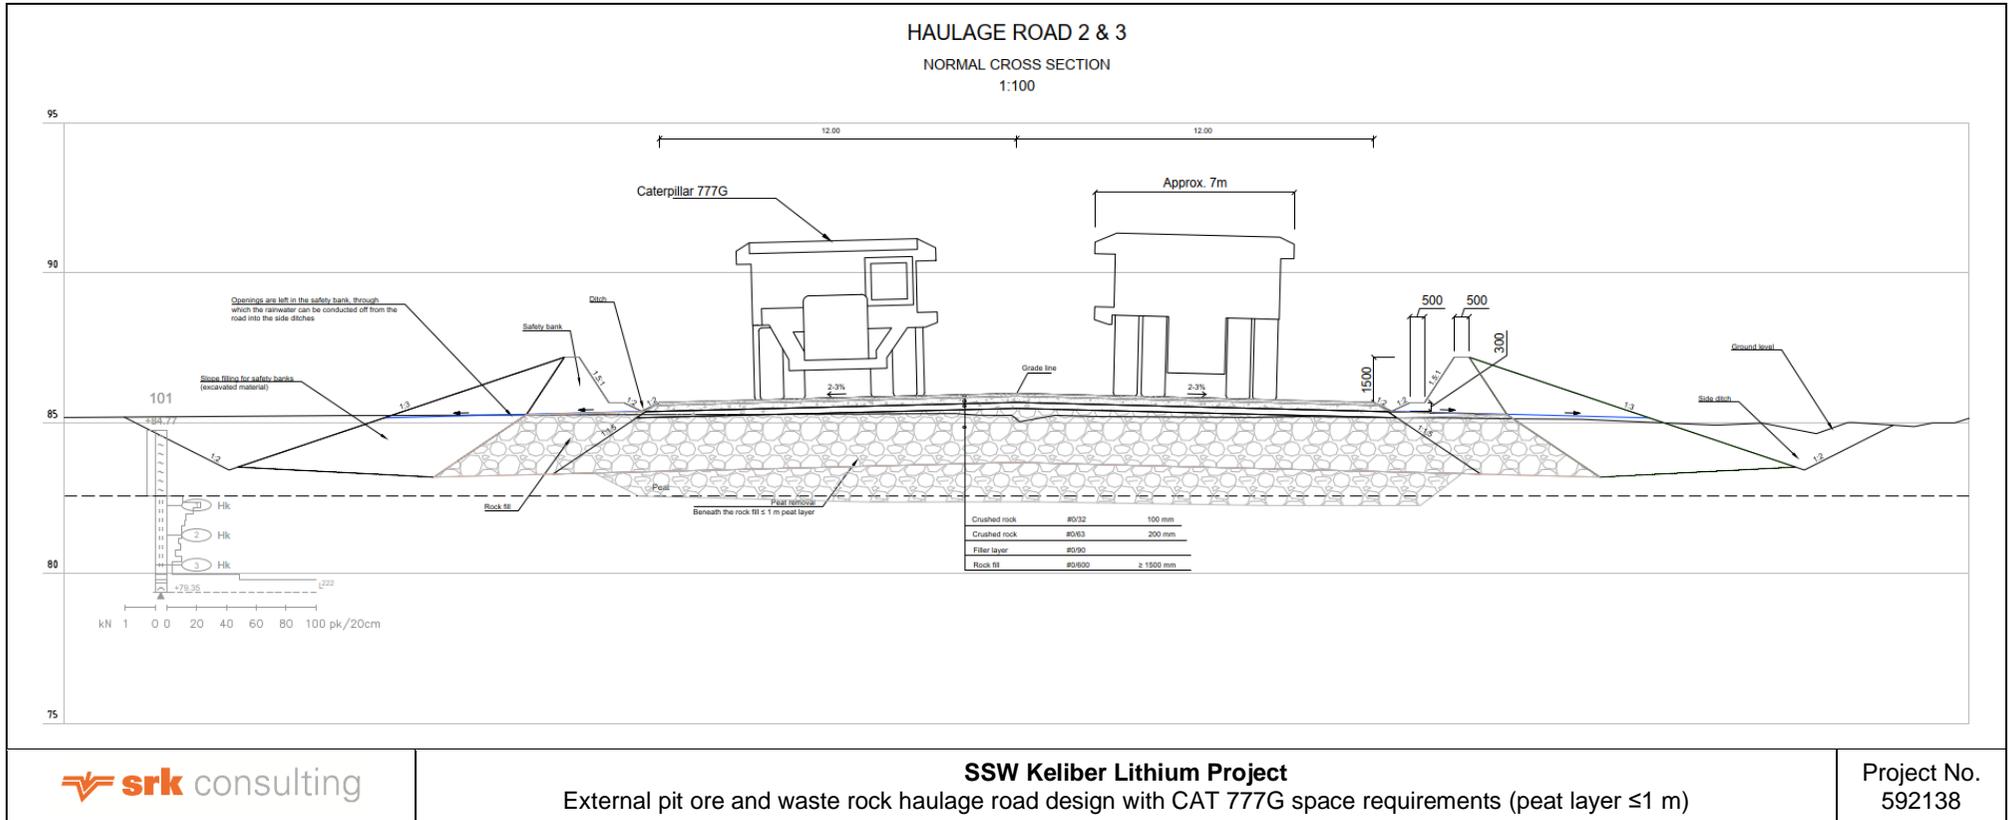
External pit ore and waste rock haulage road design with CAT 777G space requirements (peat layer ≤ 1 m)
